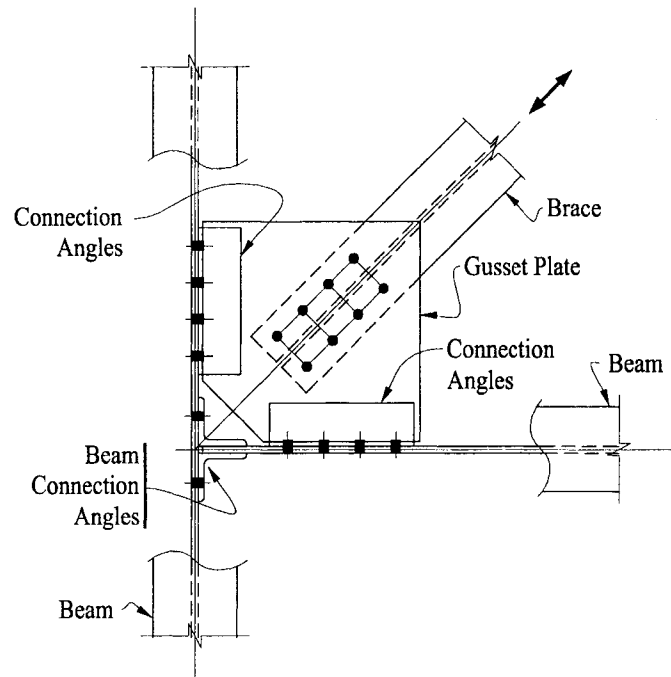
Horizontal brace connection at beam-to-beam intersection.
